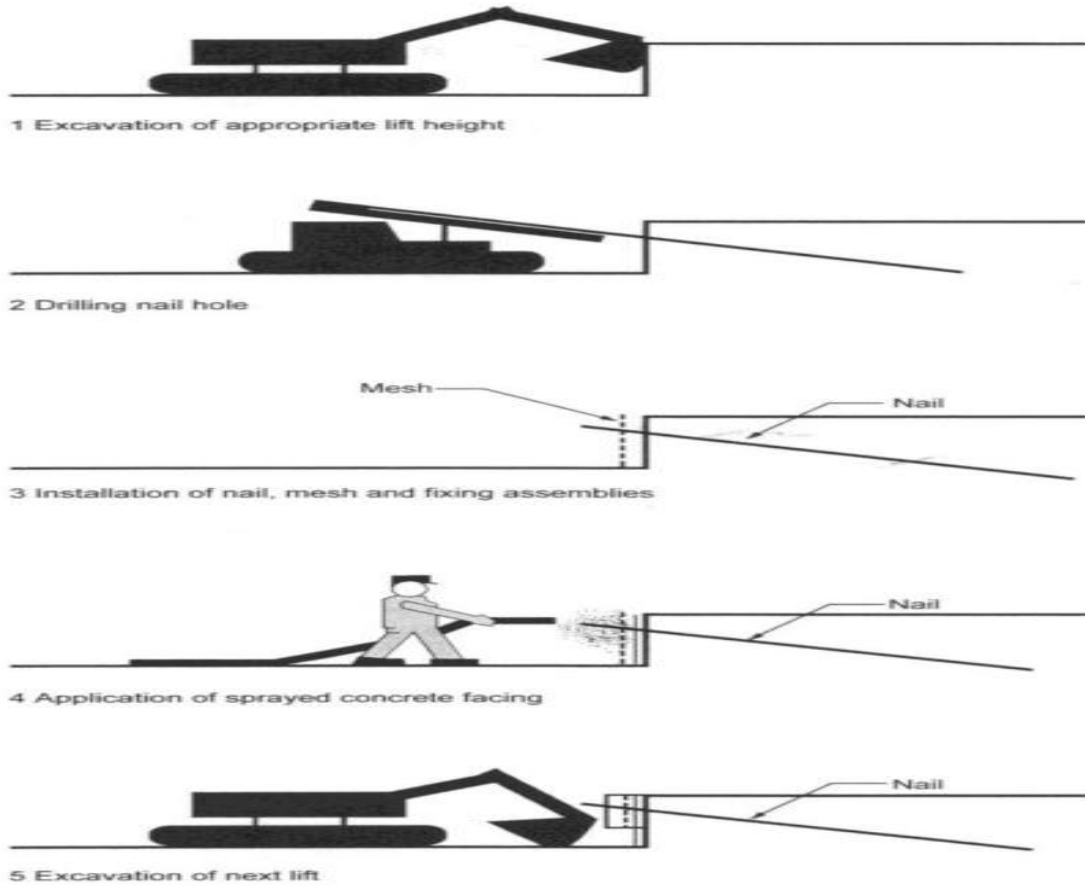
SEQUENCE OF CONSTRUCTION
